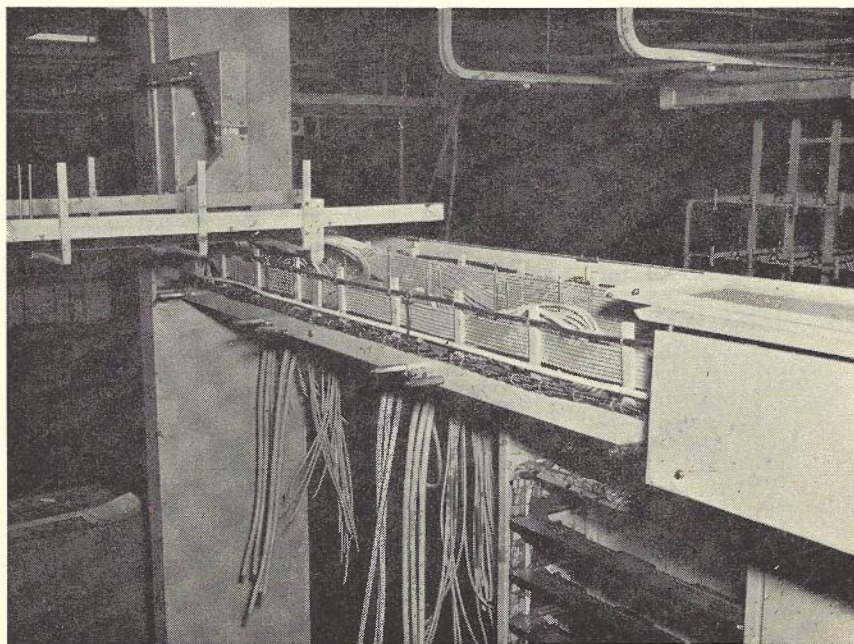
Showing Earth, Power, Multiple, F1 and F2 cabling in Position within a Frame Duct.
